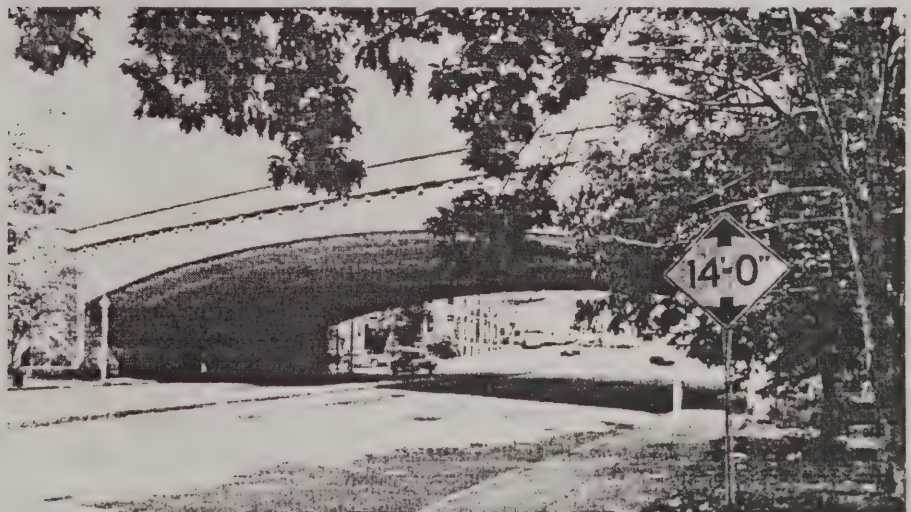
Riverway- Huntington Avenue overpass (Route 9), 1936 addition (Jon Crispin Photography, 1999)
